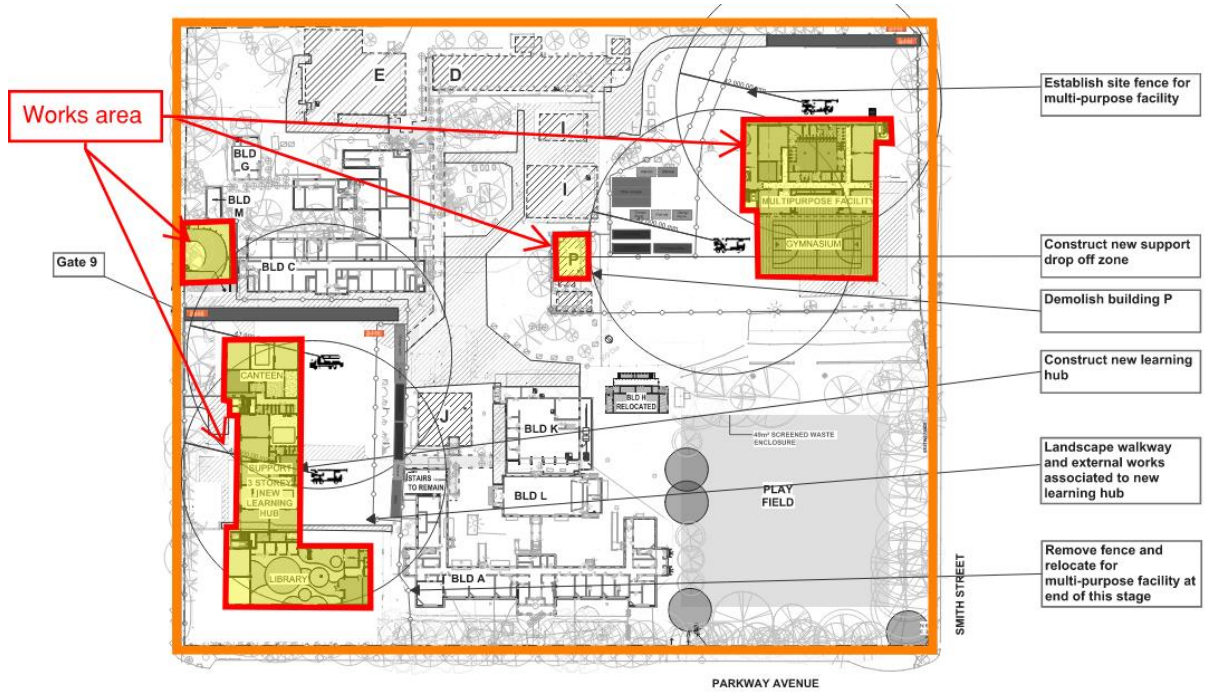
Stage 2&3 - Indicative site plan with site boundary plus works area highlighted.
